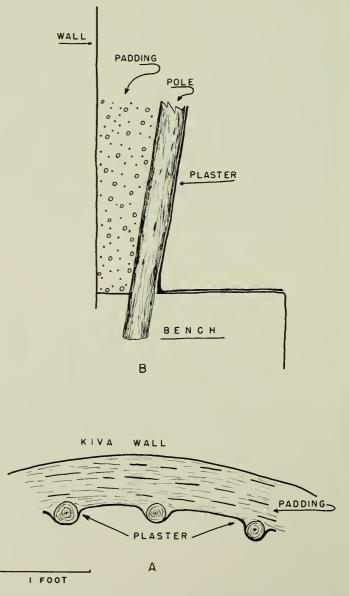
Detail of pole wainscoting at Chettro Kettle. A—cross section showing inward slant of poles; B—plan.
